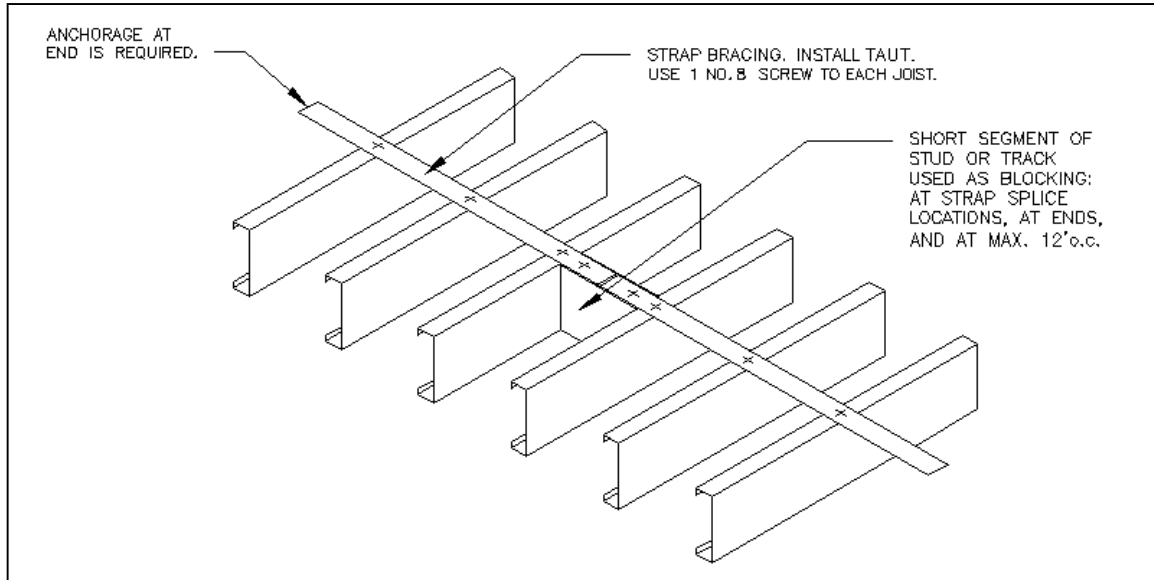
Ceiling Joist Top Flange Bracing with Continuous Steel Strap and Blocking
